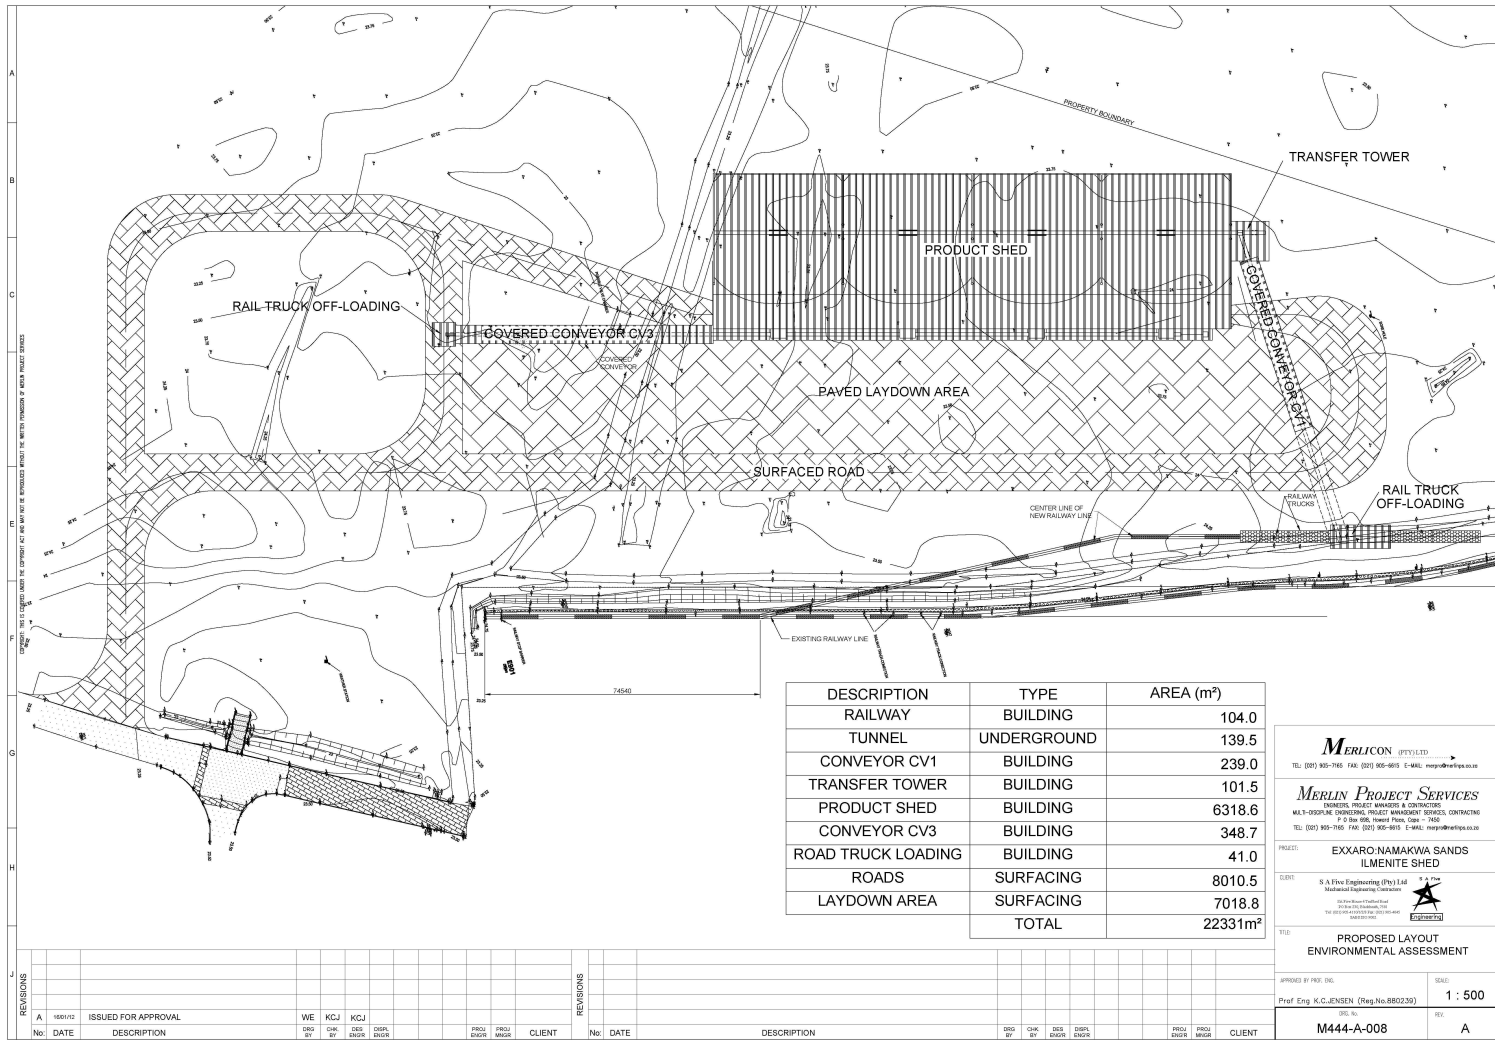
Detailed layout for the proposed warehouse shed (Ref: Supplied by SRK Consulting)
